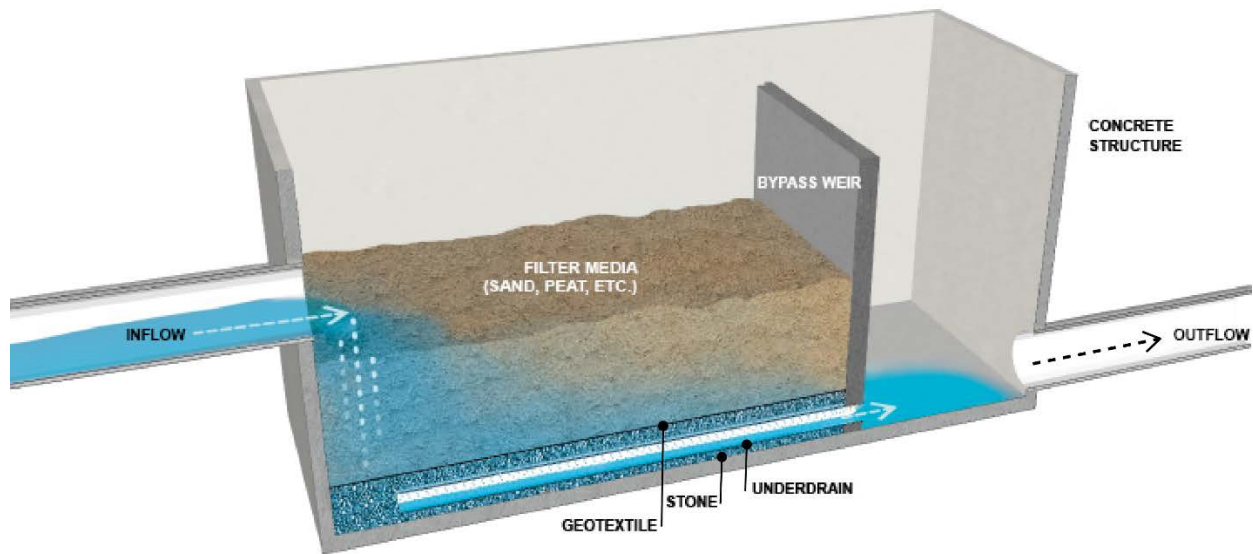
Enclosed Constructed Stormwater Filter - Common Elements
